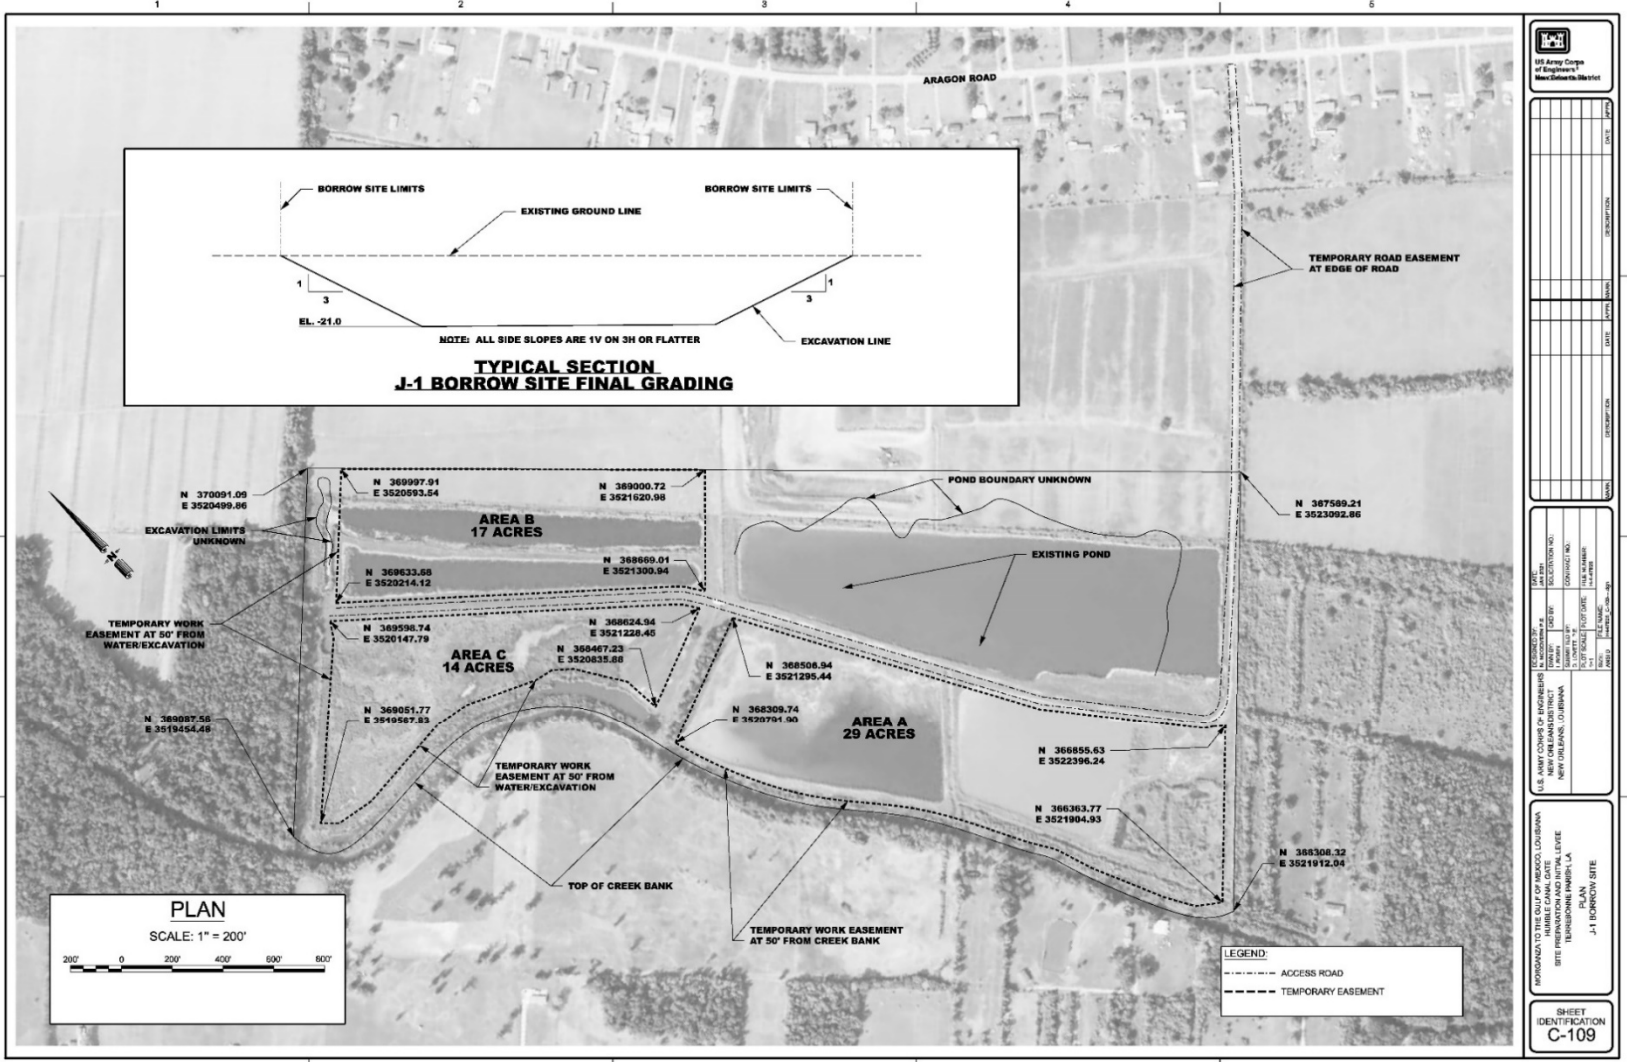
Borrow site plan sheet for Humble Canal earthen fill material
